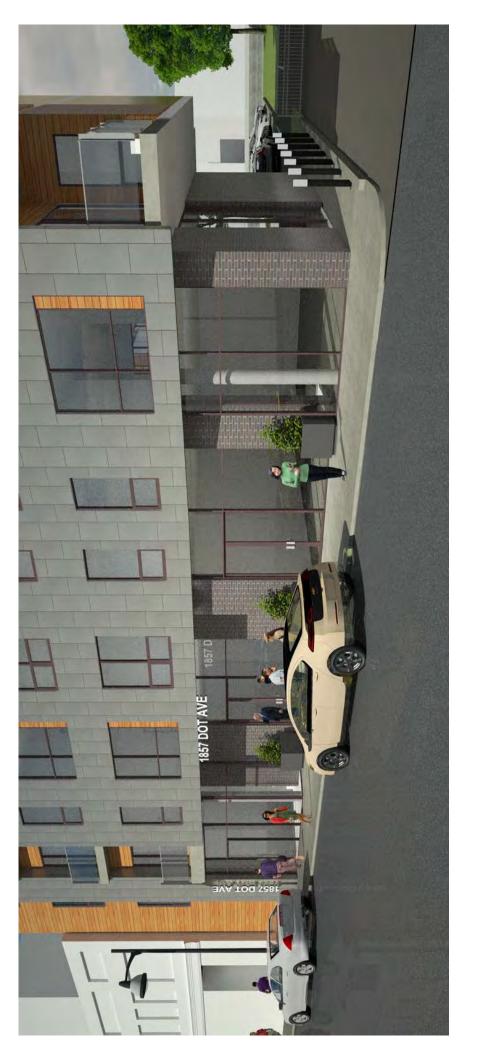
Exhibit D: Renderings, Site Plan, Floor Plans, Building Elevations
